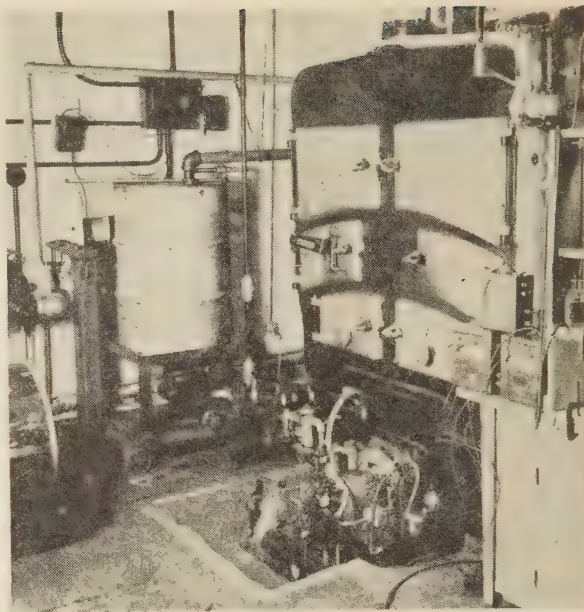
VIEW OF BOILER FRONT AND BURNER AT HEATING PLANT OF NATIONAL AIROIL BURNER COMPANY
